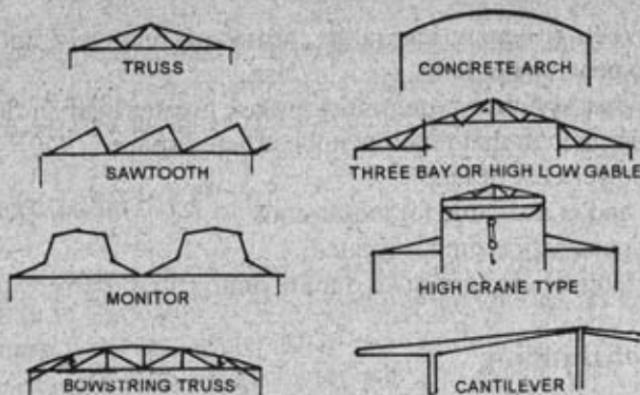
TYPICAL TYPES OF ROOF STRUCTURES
